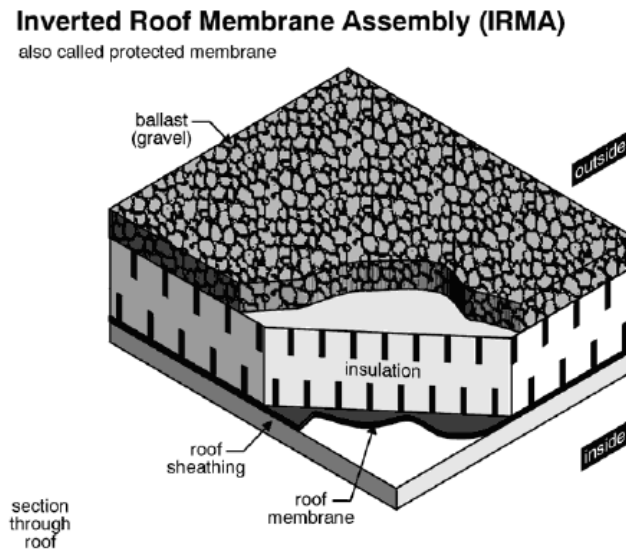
Structural design of an inverted roof (Buttery et al., 2004)
